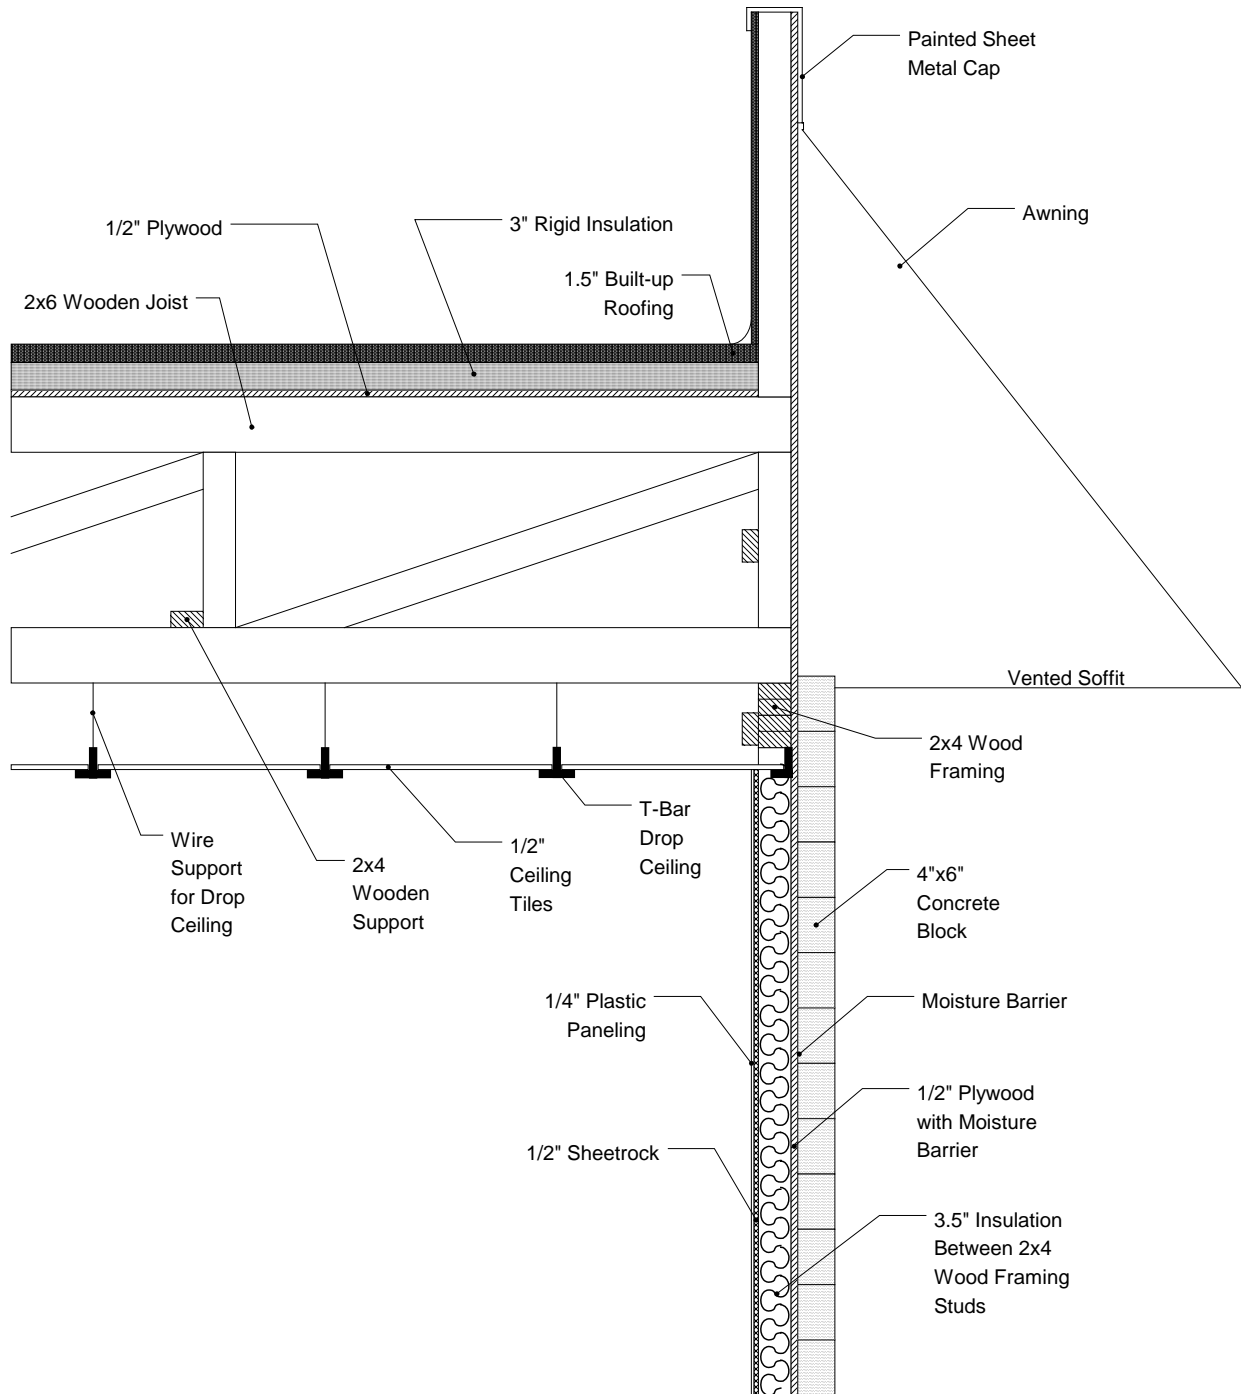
Roof, Ceiling and Wall Construction with Awning
